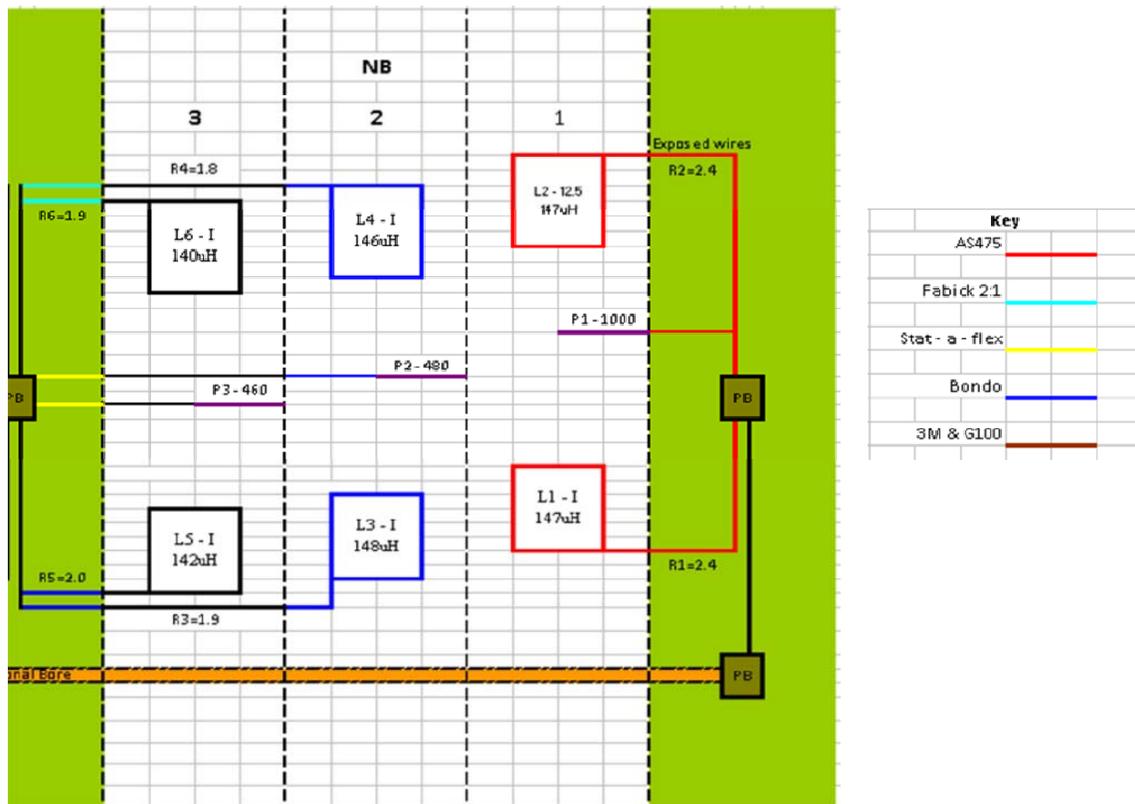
Loop Layout for Northbound Site 112 on I-75
